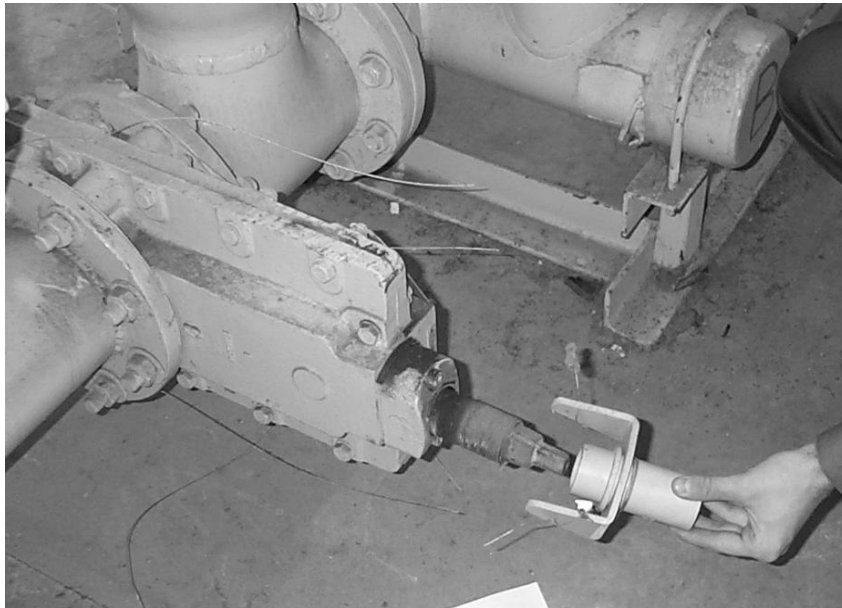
Example of a valve spindle cover sealing fitted to a gate valve.
